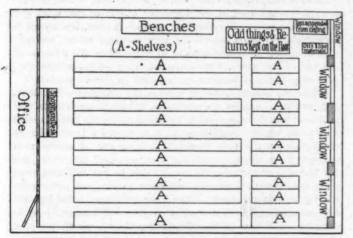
Floor plan of the room in which the repair parts for all models are kept, showing the advantageous arrangement of shelves for storing the parts
